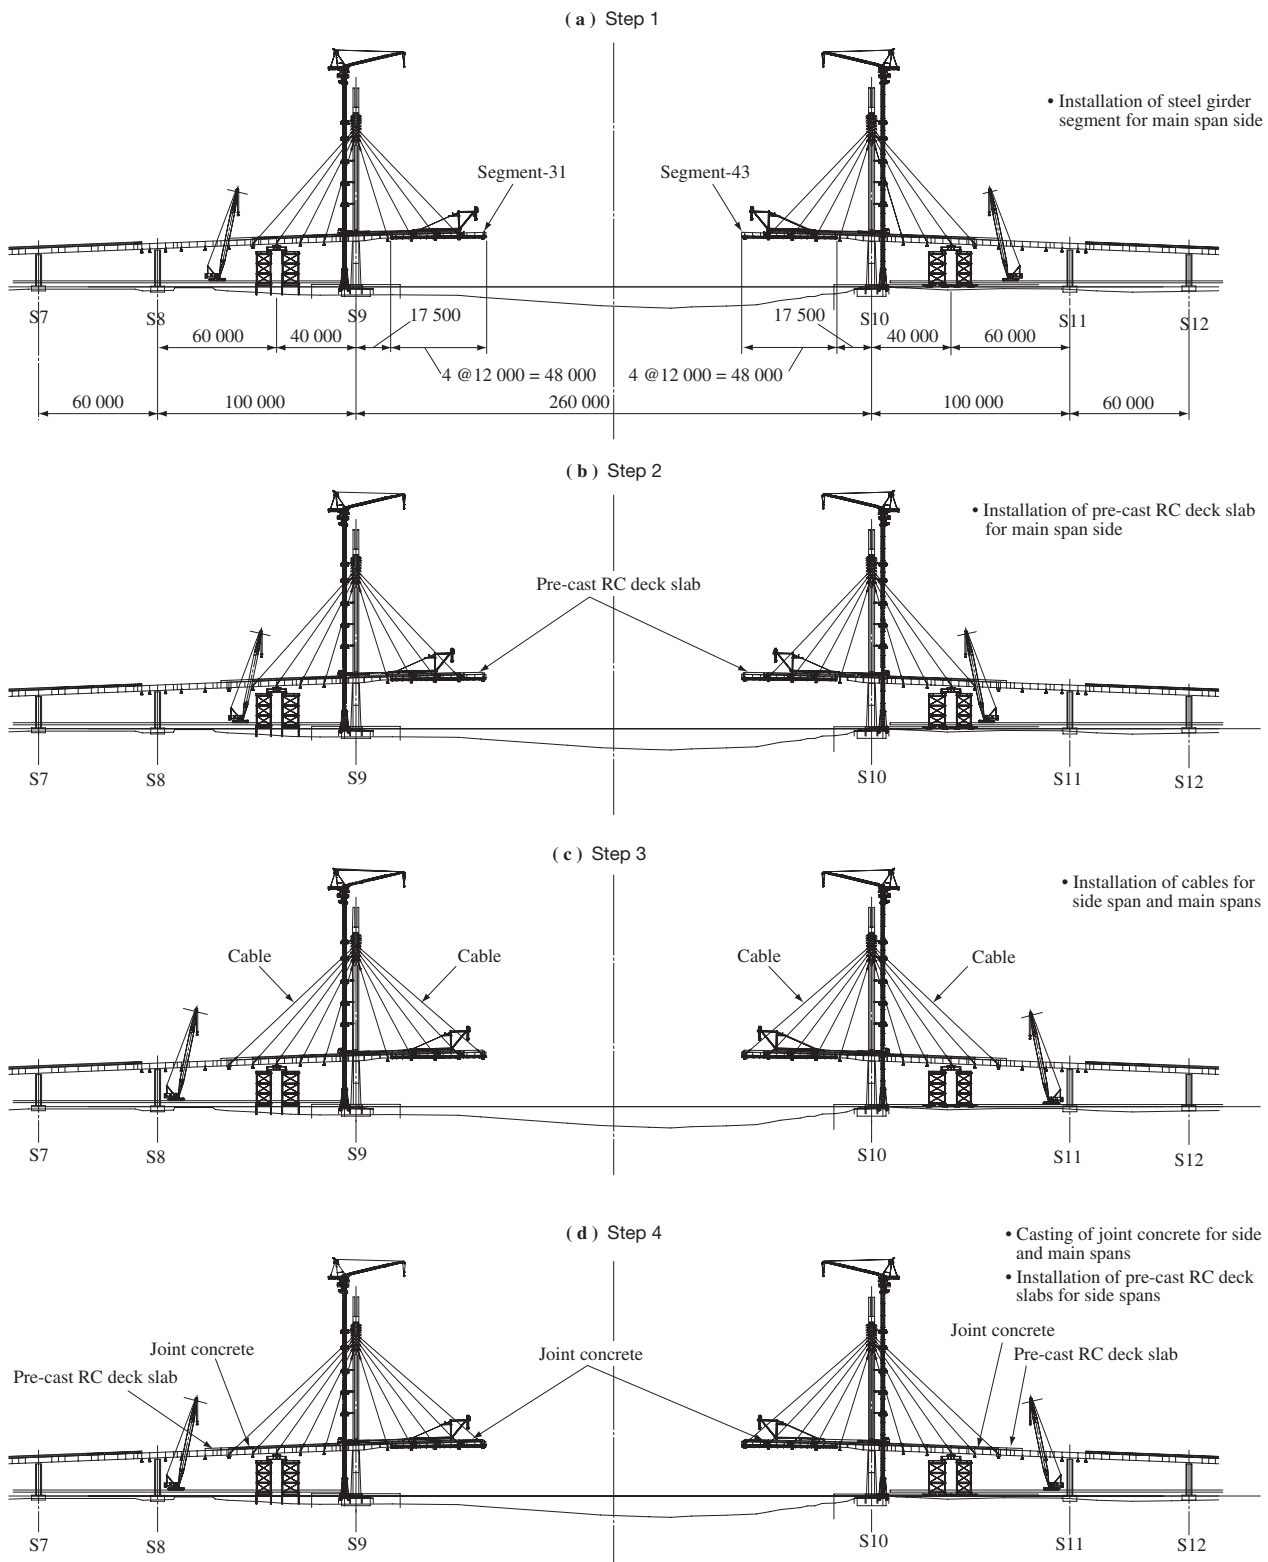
Erection procedures on cable-stayed bridge (unit : mm)
